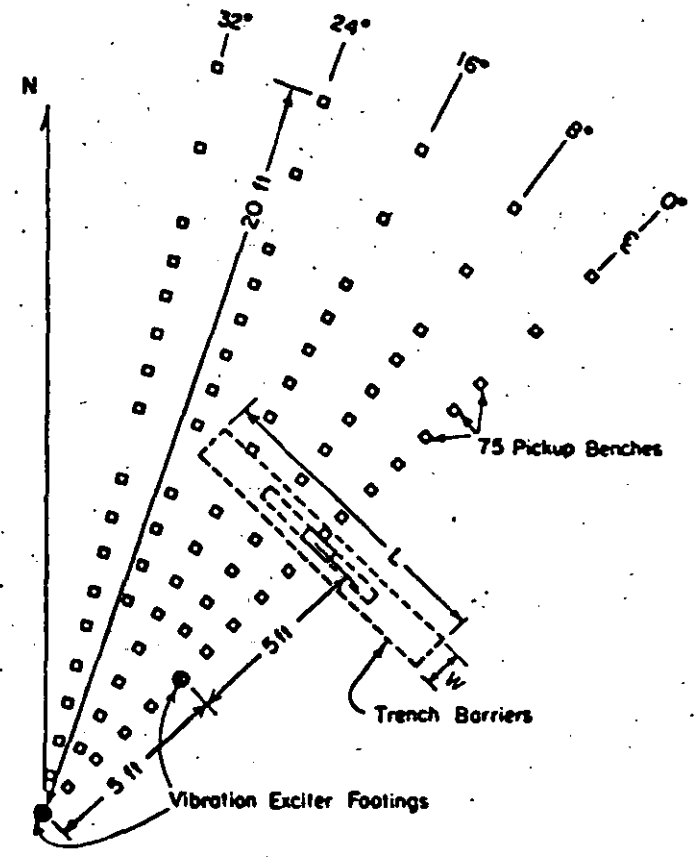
Plan view of field-site layout for passive isolation (from Woods, 1968).
